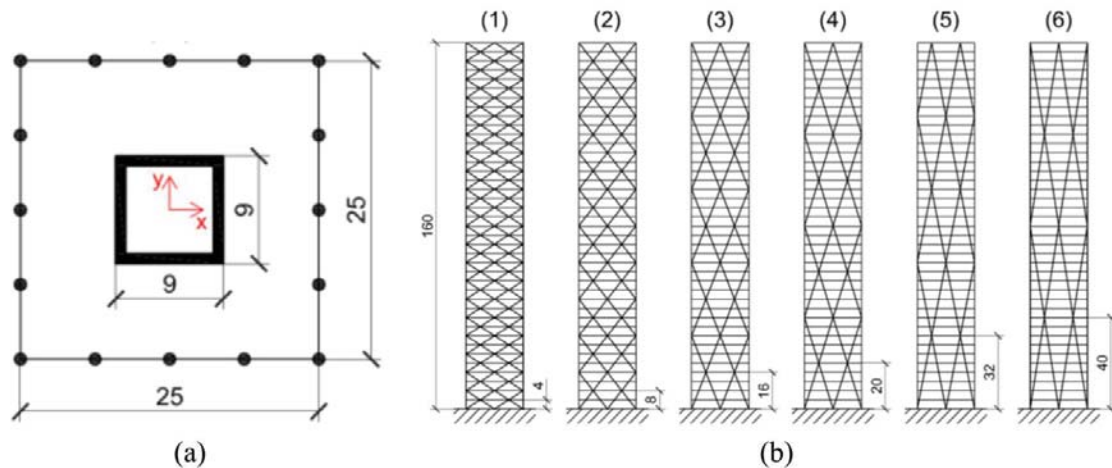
Building geometry: (a) floor plan; (b) lateral views. From Lacidogna et al. [13].
